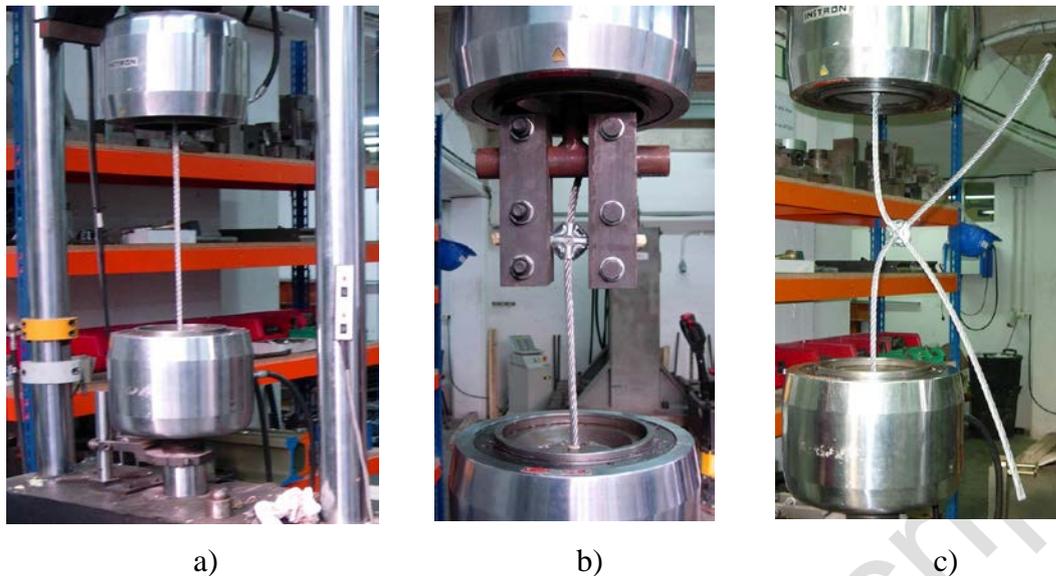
Laboratory tests: (a) uniaxial tensile test on cable, b) slip test on clip-cable assembly, (c) opening test on clip-cable assembly.
